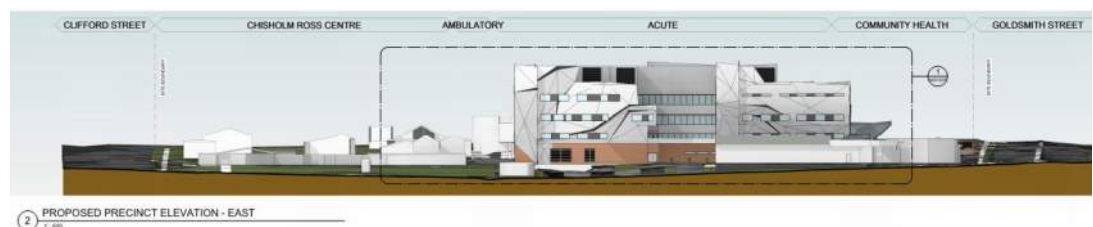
Precinct elevation showing the proposed works viewed from the East (toward Faithful Street) (Source: BLP)
